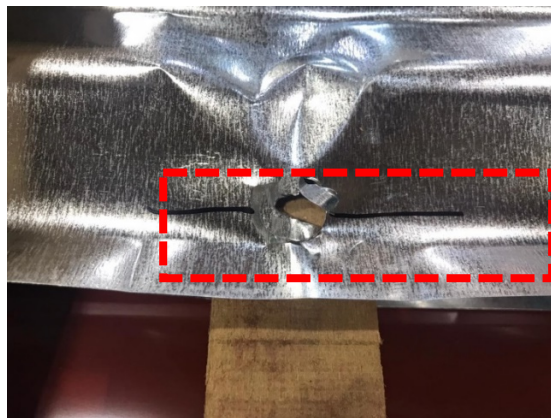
Pull through failure occurred between steel cladding and Purlin, from (Muhammad, 2020).
